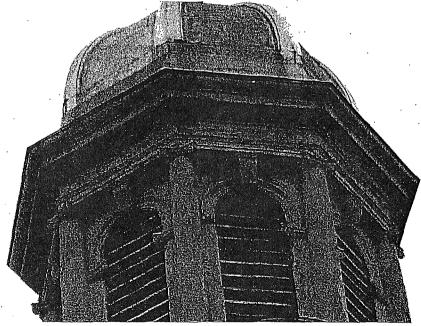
East tower detail, constructed entirely of pressed sheet metal, showing missing architectural detail, loss of gilding and protective paint, and corrosion stains. Birds were nesting inside the towers.
